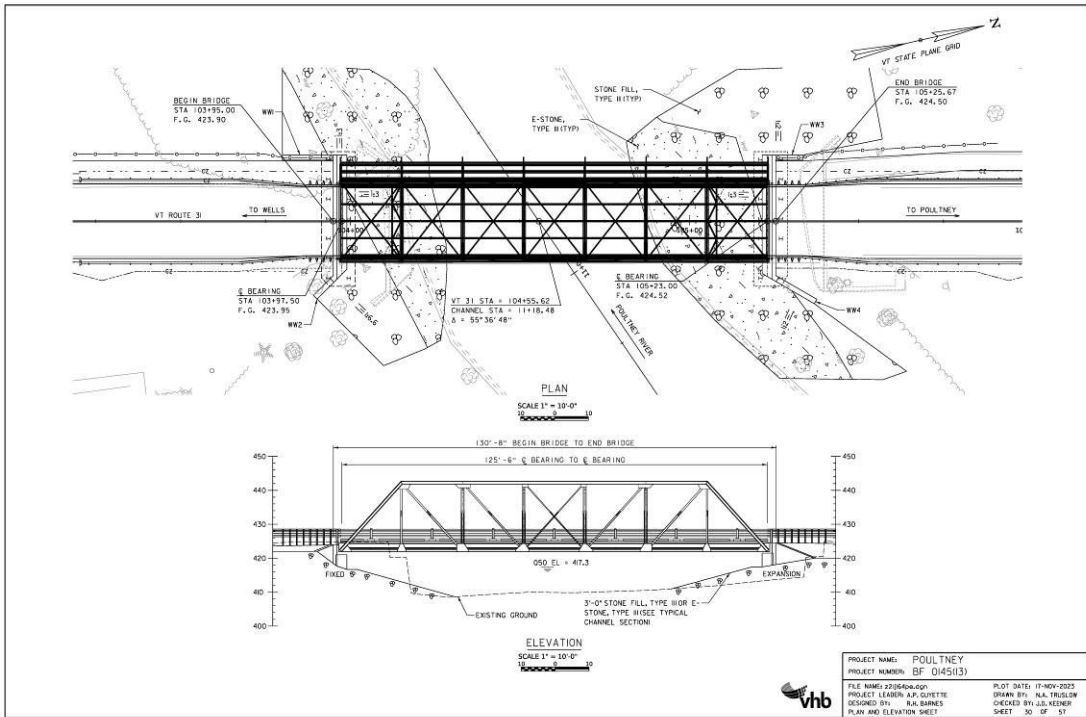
Plan and Elevation Sheet, Sheet 30 of 57. Preliminary Plans, November 2023.
